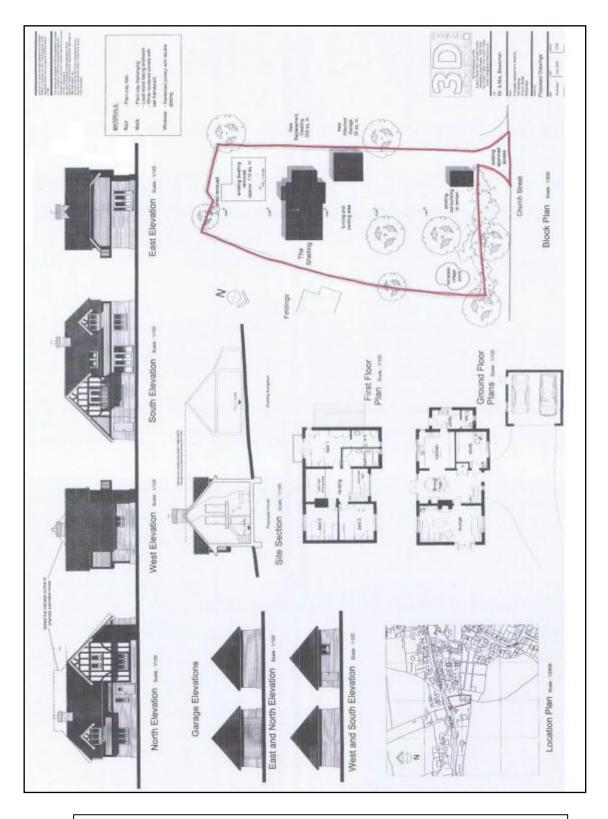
The Sheiling, Rotherfield: Development Plan (adapted from architects drawing)
